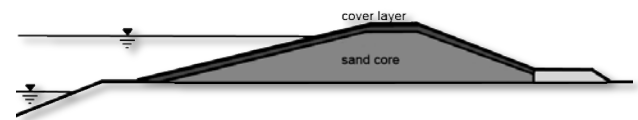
Example cross-section of a German sea dike with sand core and cover layer
